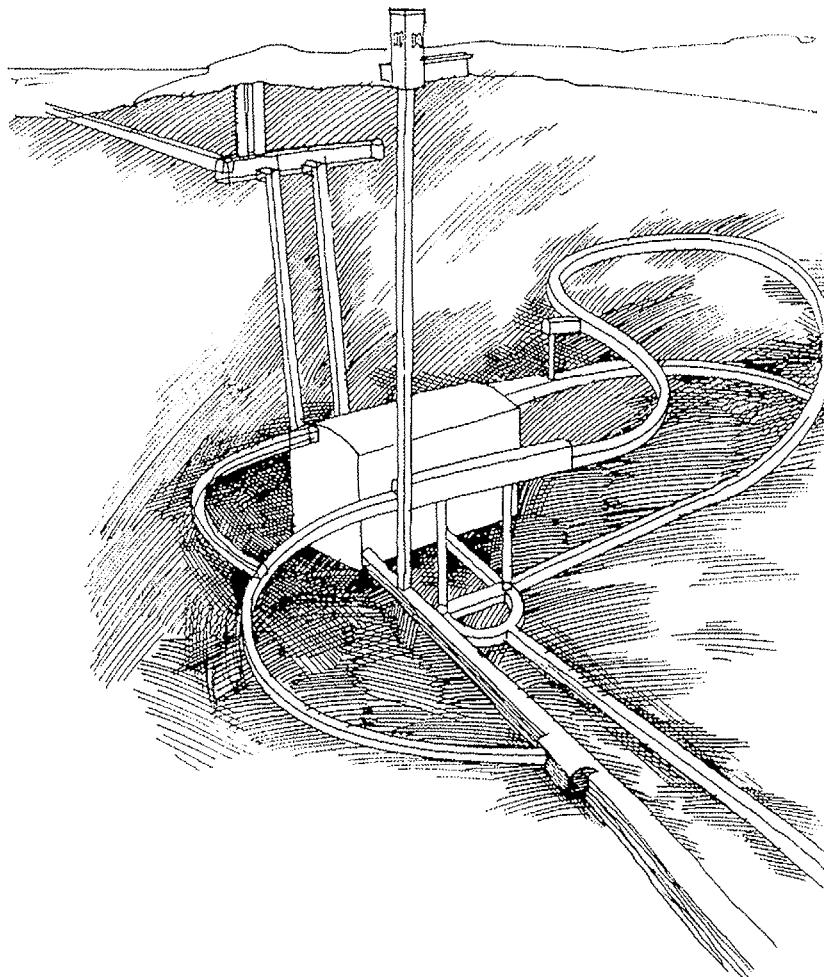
Typical tunnel system in a hydroelectric power plant.
